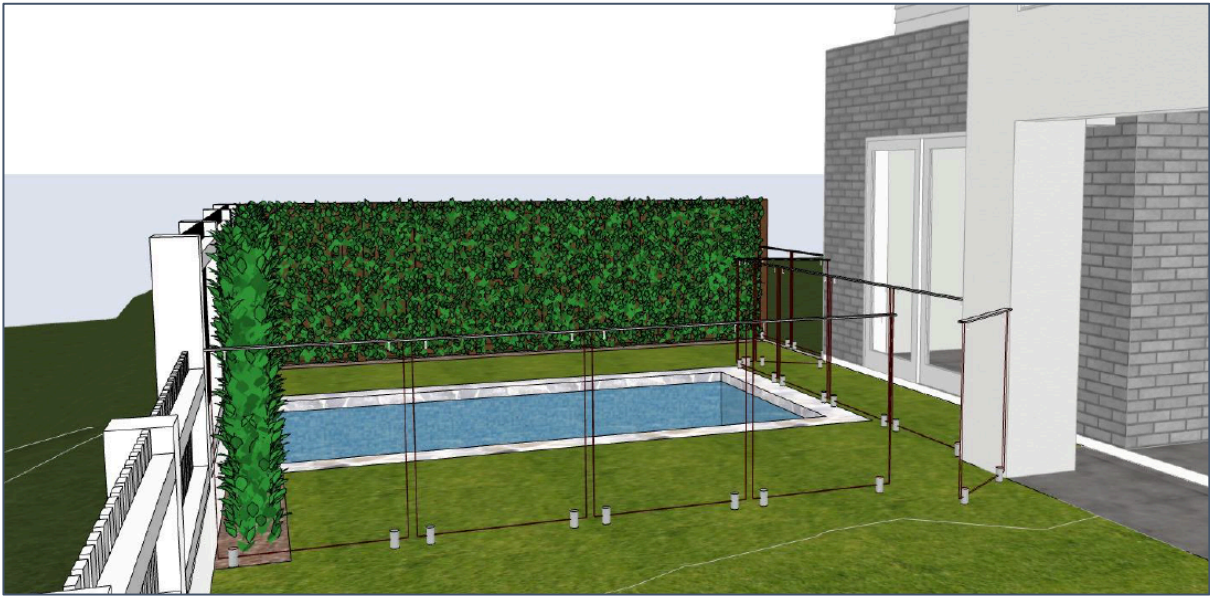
Proposed pool and surrounding garden area (Andy’s Home Design, 2024)
